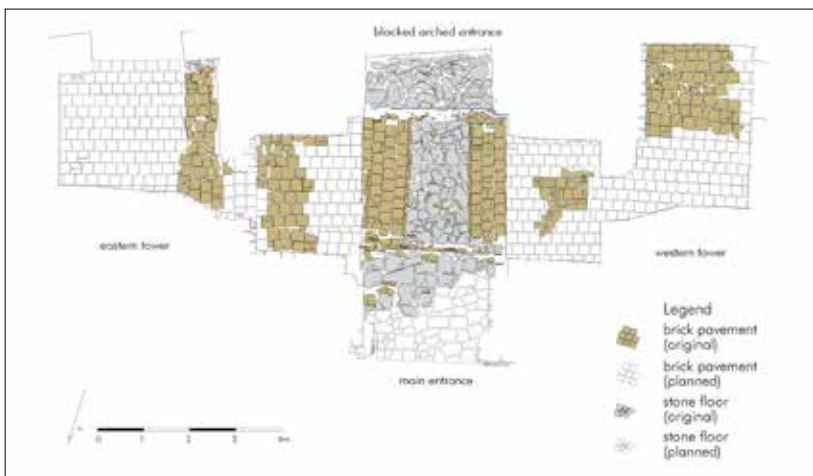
Instructions for local supervisors: reconstruction of floor paving, distribution of historic and new bricks
